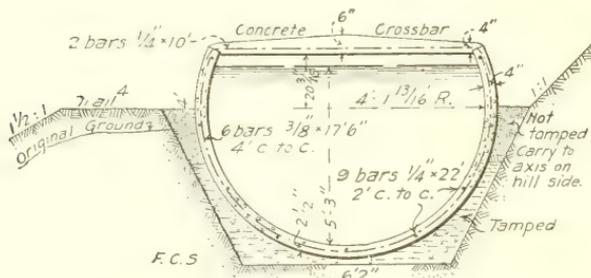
Cross section of open concrete-lined canal, Yakima project, U. S. Reclamation Service, North Yakima, Wash.
